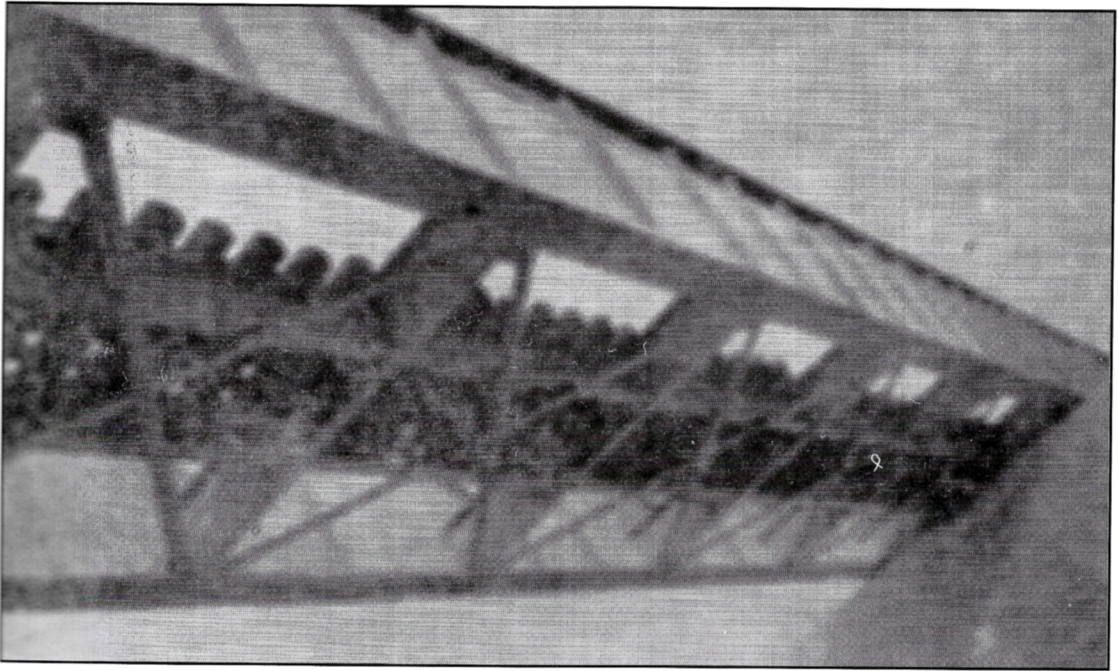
Through Type Plate Girder Bridge Stringers, Cross-girders and Cross-bracings are seen from bottom side
